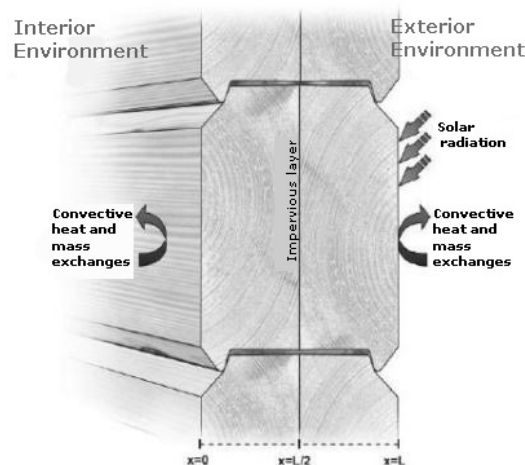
Laminated Wall with Felt Joints Made in Solid Wood
